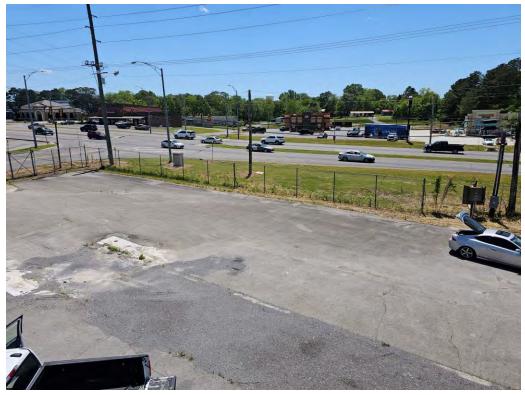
View southeast of the intersection of Mathis Mill Road and U.S. Highway 431.
